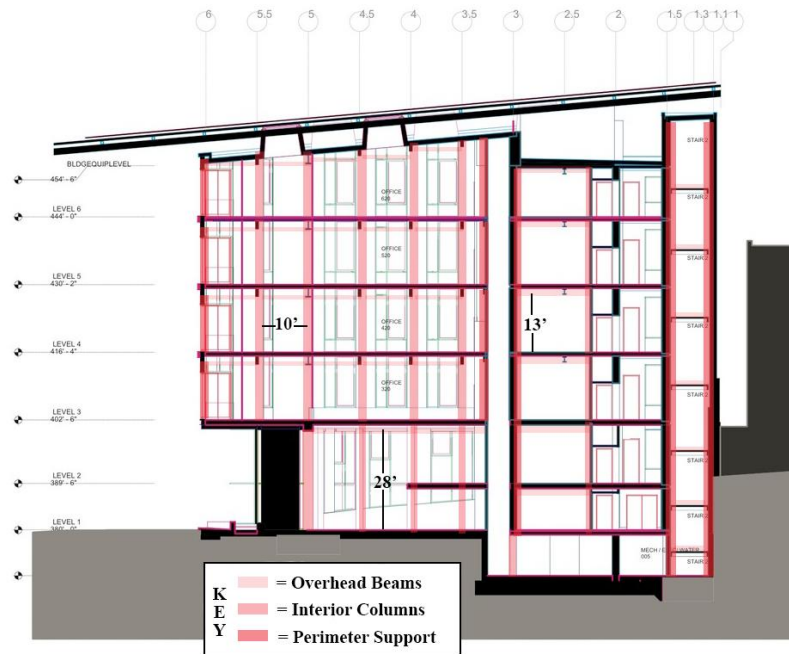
Structural Systems: Section A. Adapted from Archdaily & MHP
